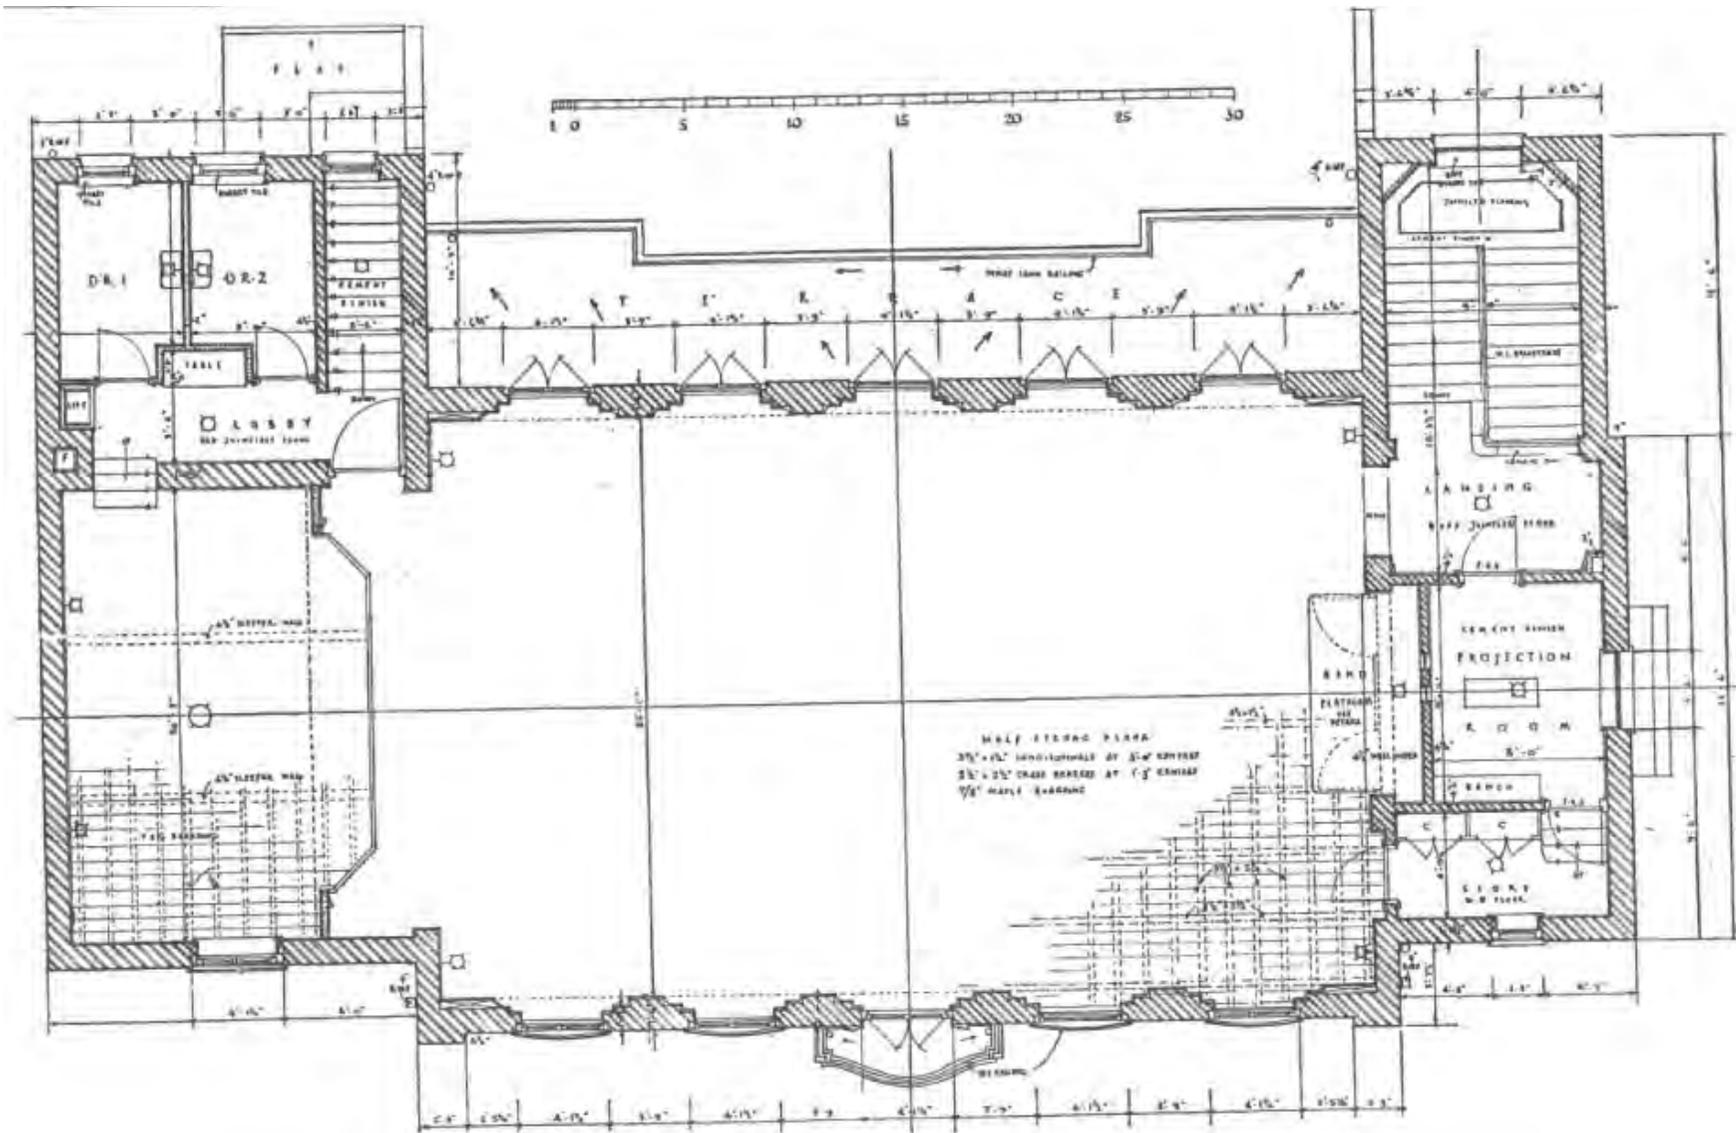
Original plans of the club house First Floor (Architects' Journal)
